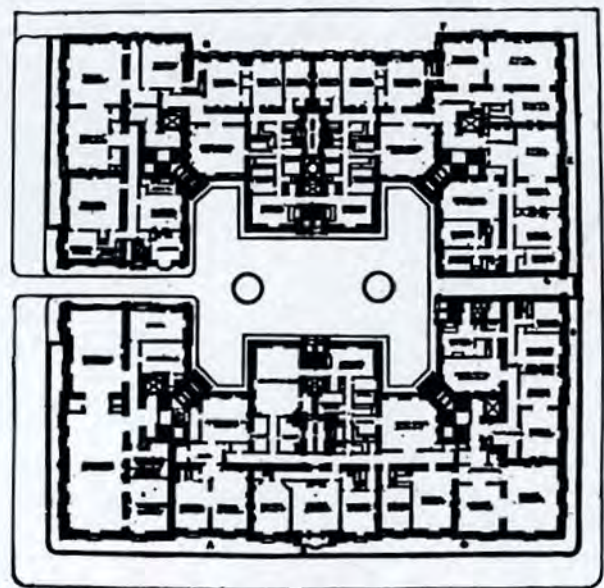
Dakota. Henry J. Hardenbergh. 1882. Plan of typical floor.
